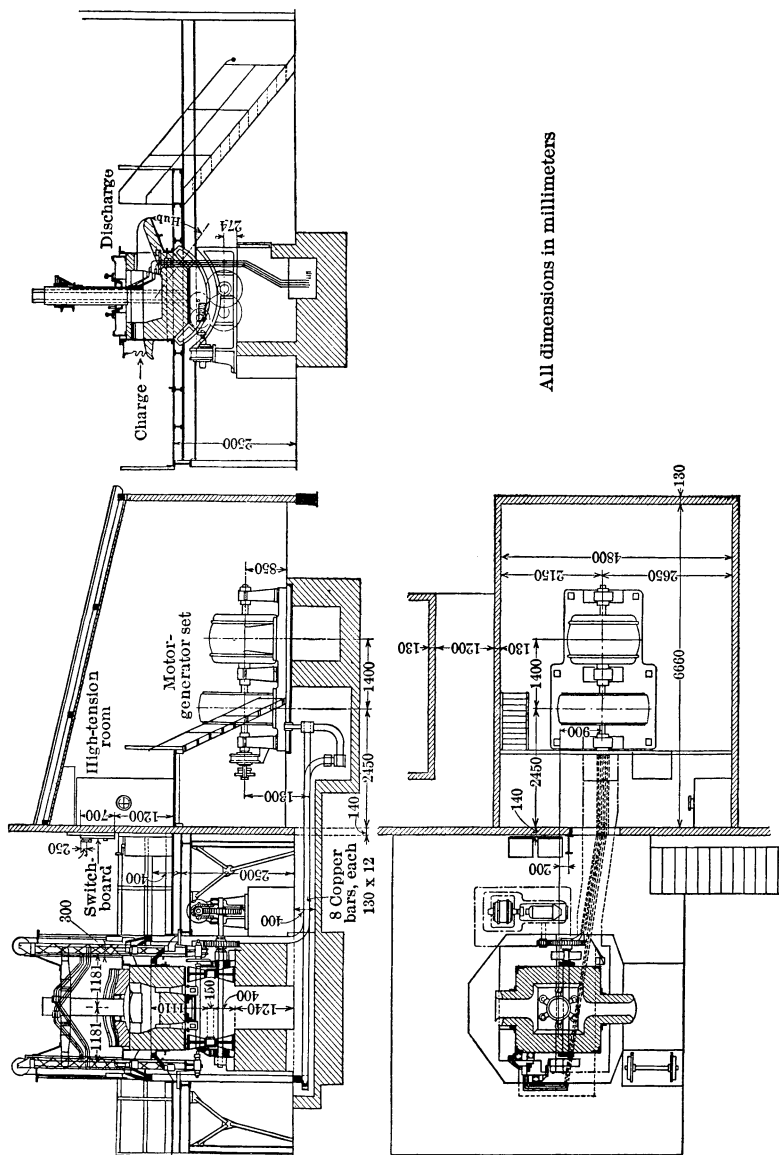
Arrangement of electric-furnace steel plant, Oberhausen, Germany.
